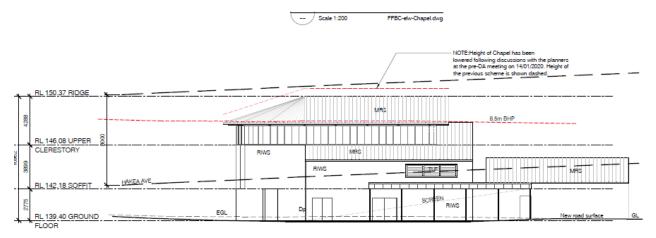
Areas of Building Height non-compliance indicated by red dashed "8.5m BHP" line on the East Elevation Looking from Hakea Ave (Source: Architectural Plans, prepared by Hector Abrahams Architects)
